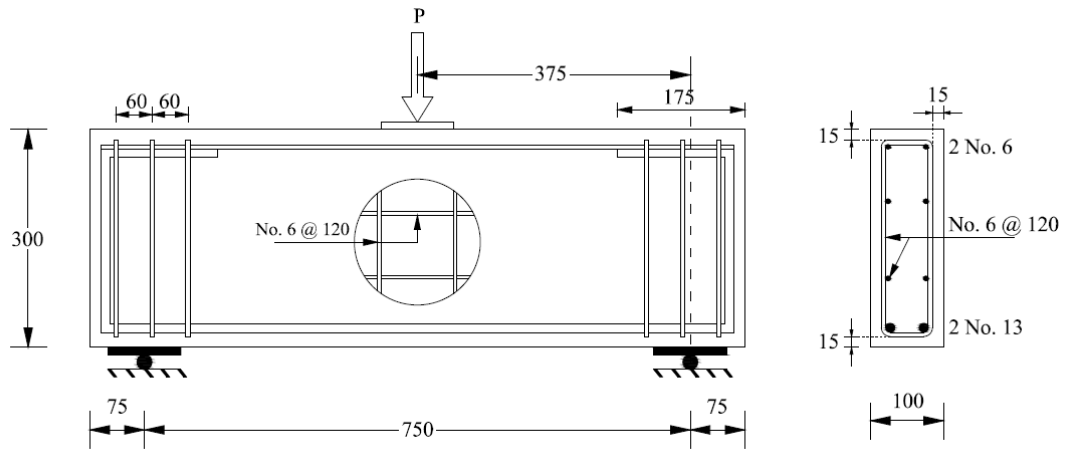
Detailing of RC Deep beam (units are in mm)
